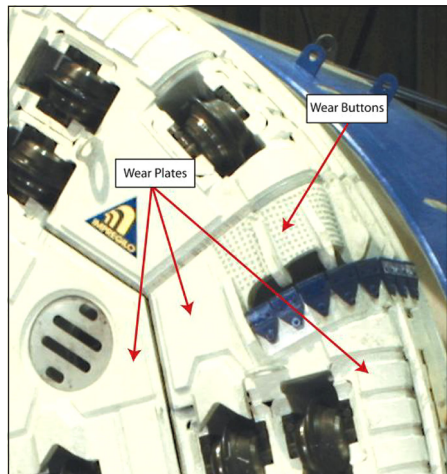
Example of a cutterhead designed for abrasive hard rock conditions
